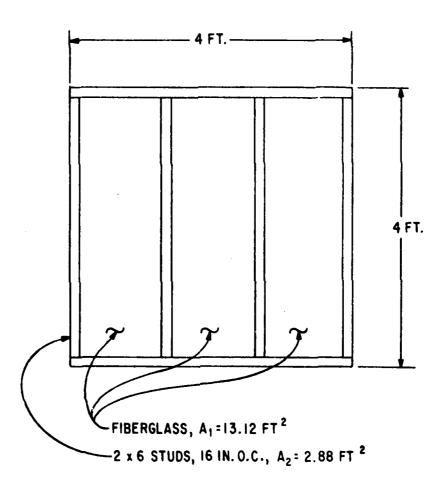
Layout of a 4 Foot by 4 Foot Stud Wall
